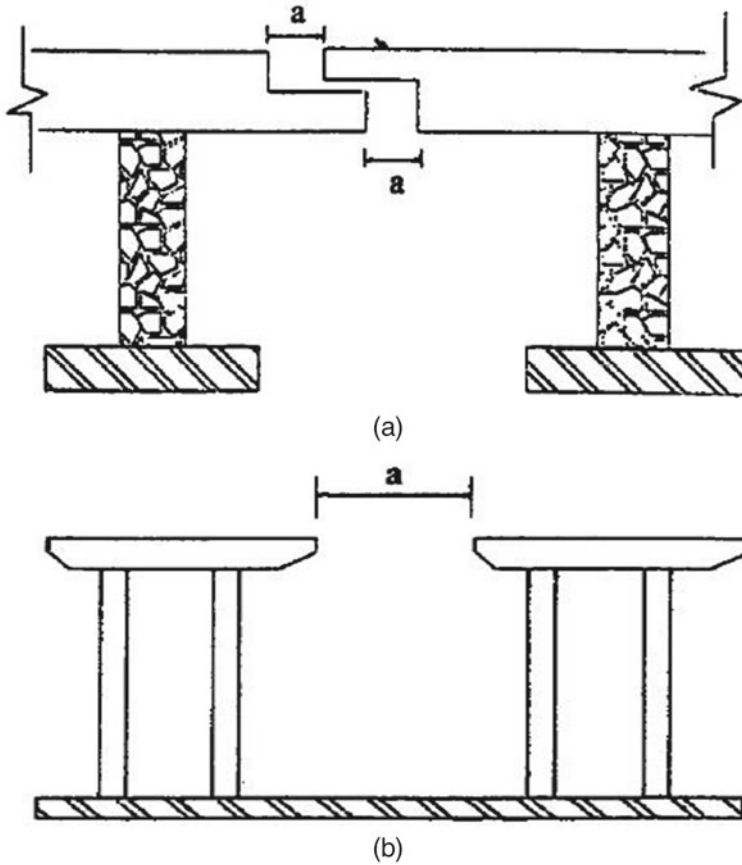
Pounding effects: buildings with different floor heights [3]
